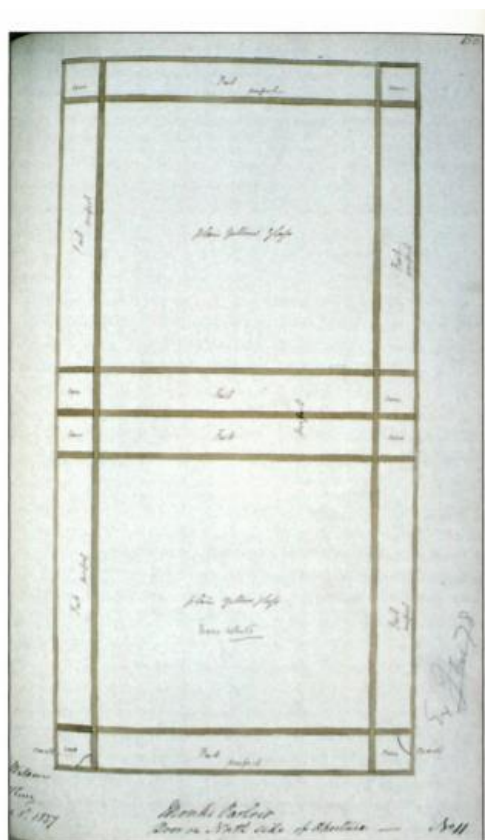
George Bailey, Plan of window from door on north side of the aperture, Monk's Parlour, John Soane's Museum (London), c. 1837. Dorey, "The History of the Installations," 55
